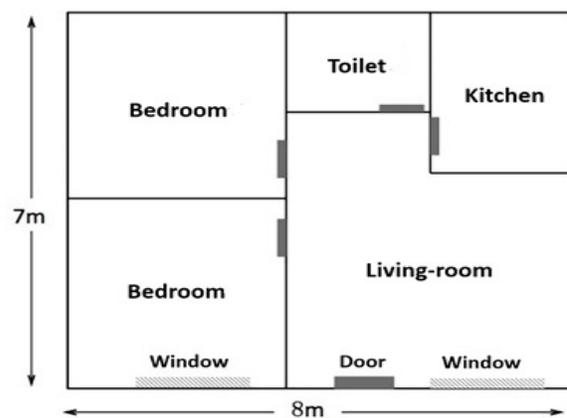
Floor plan of a house in the “One Household with Multiple Generations” project
